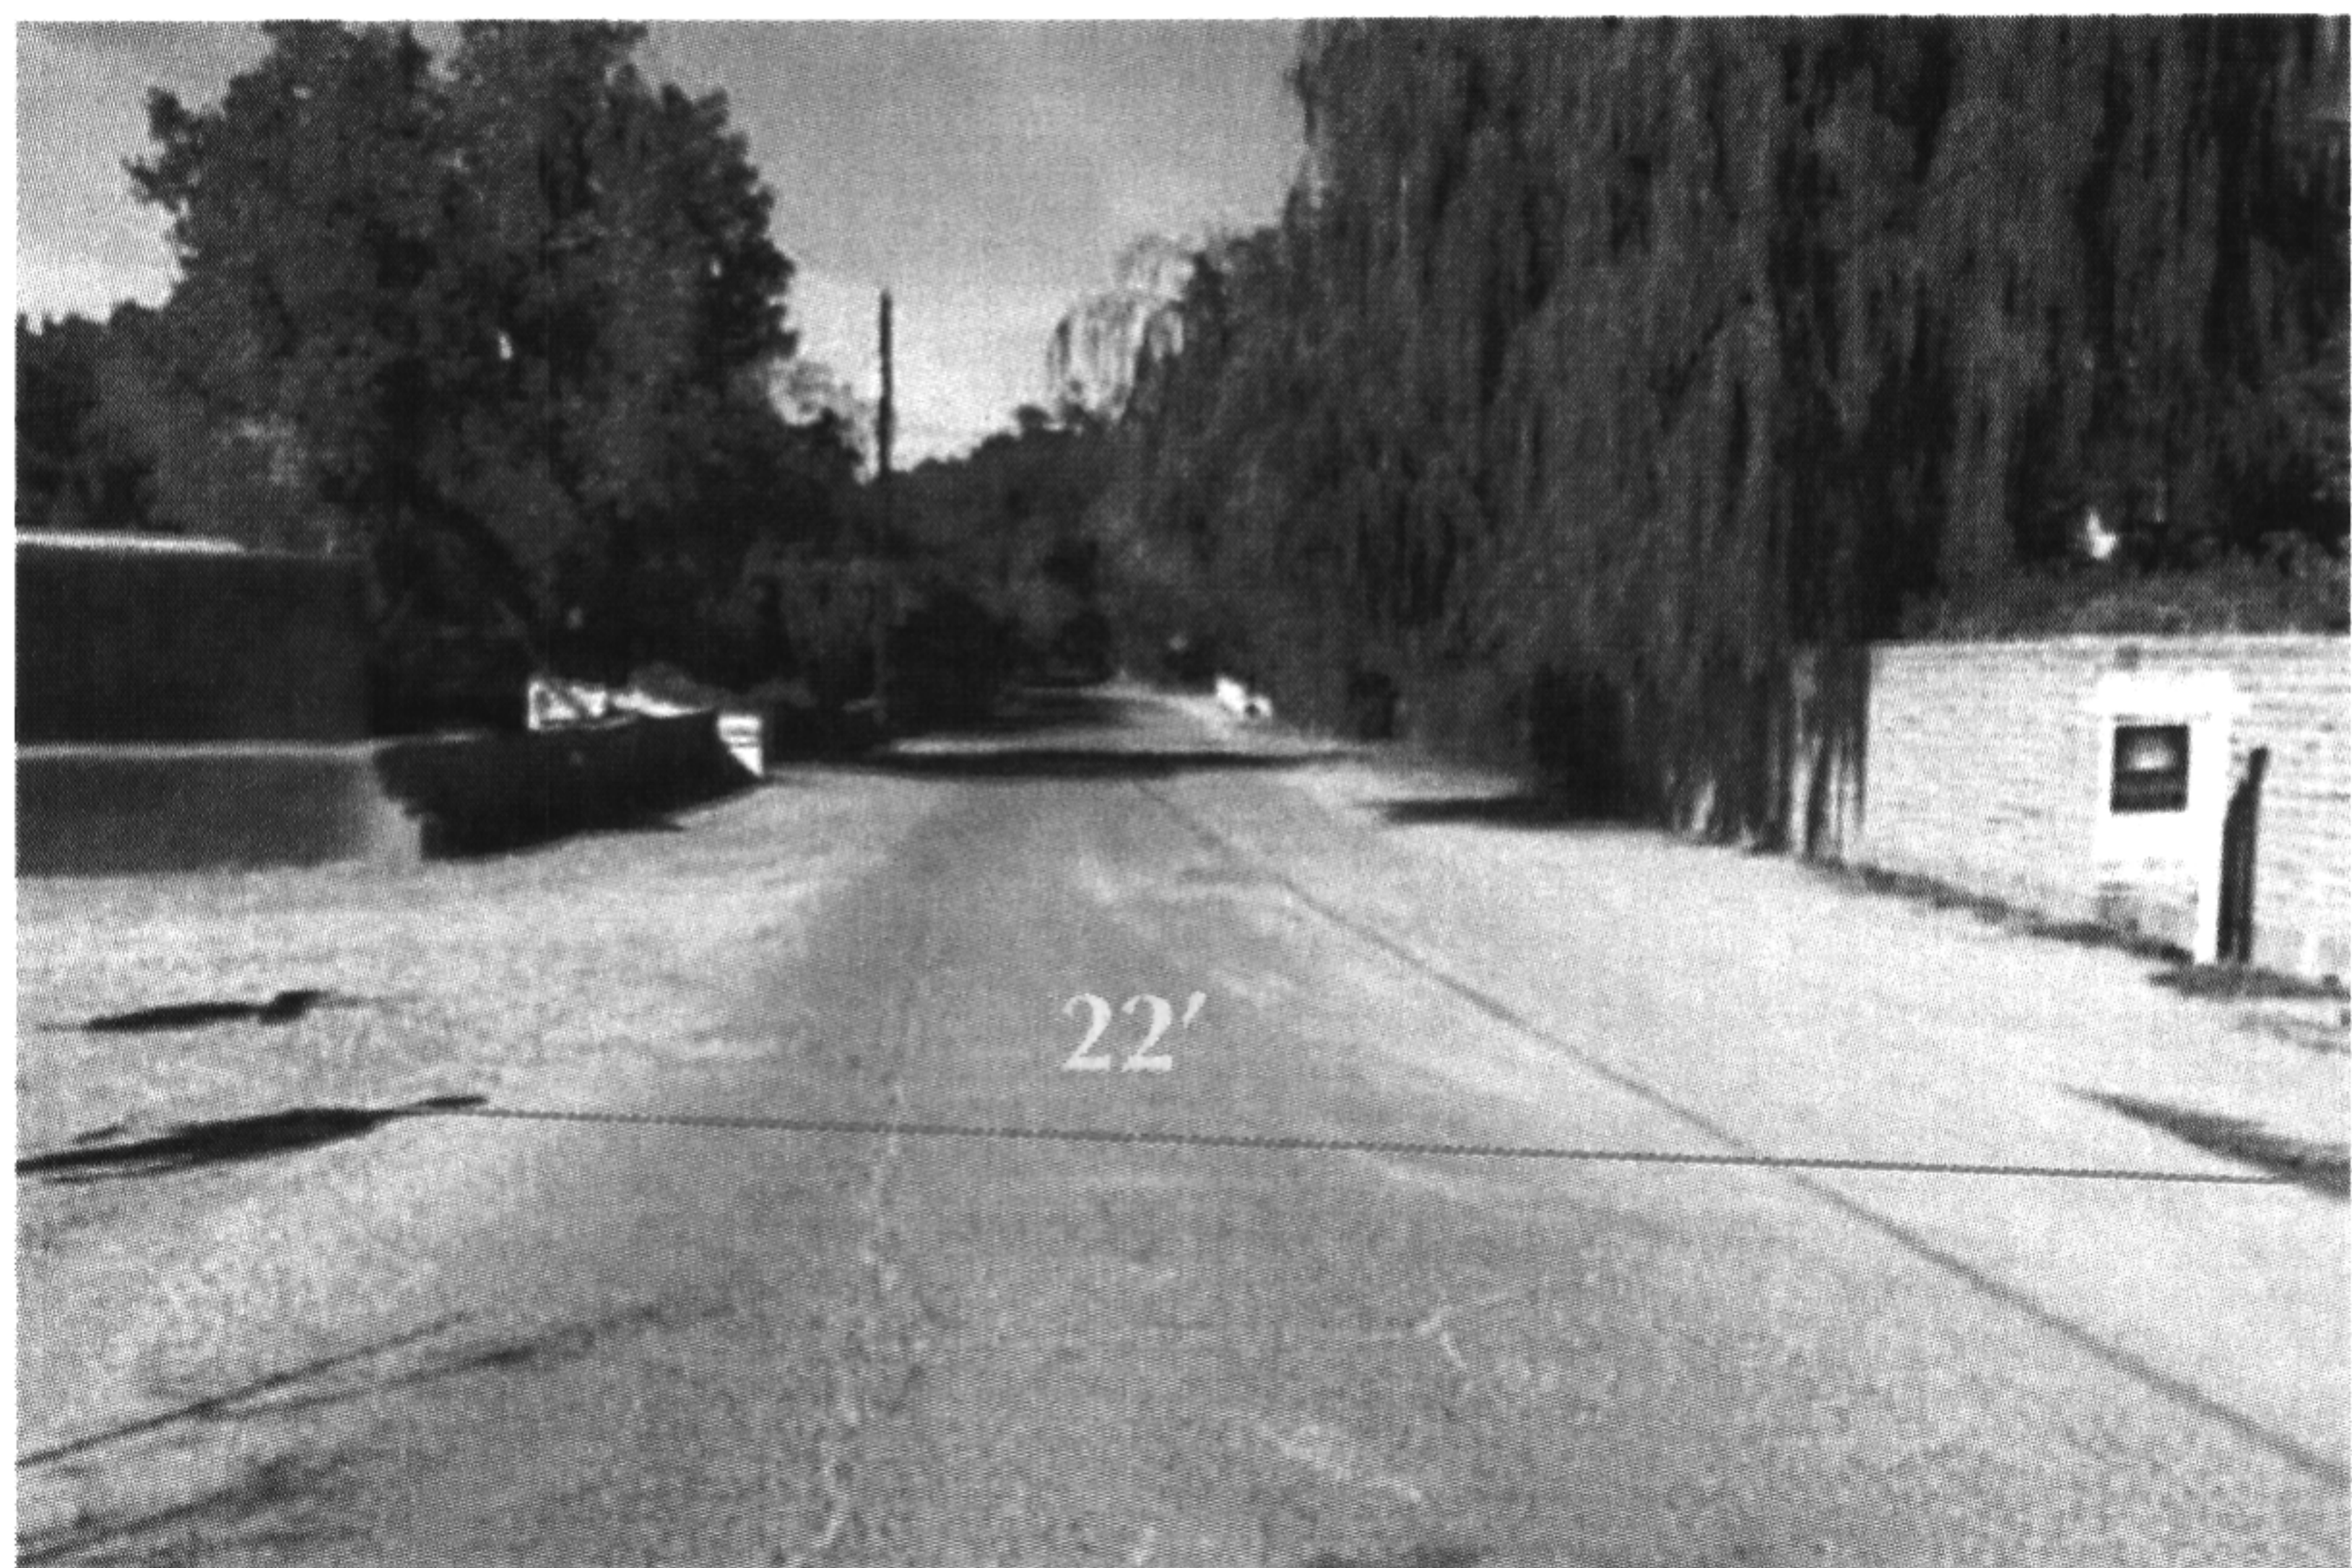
Joem Lane North of Griegos, classified as an “access local street.” Eight houses are accessed off this street. Pavement is 24’ wide with no sidewalk, while the standard is 28’, or with intermittent parking off-street and mountable curb, 26’.
